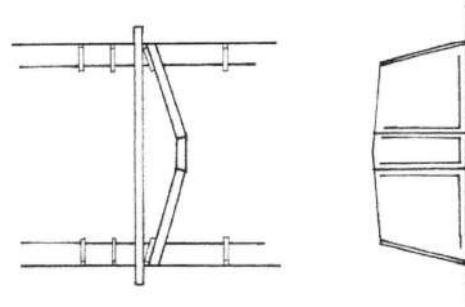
Portsmouth Dock, 1656-58. Plan and elevation of gate (Lavery 1981).
